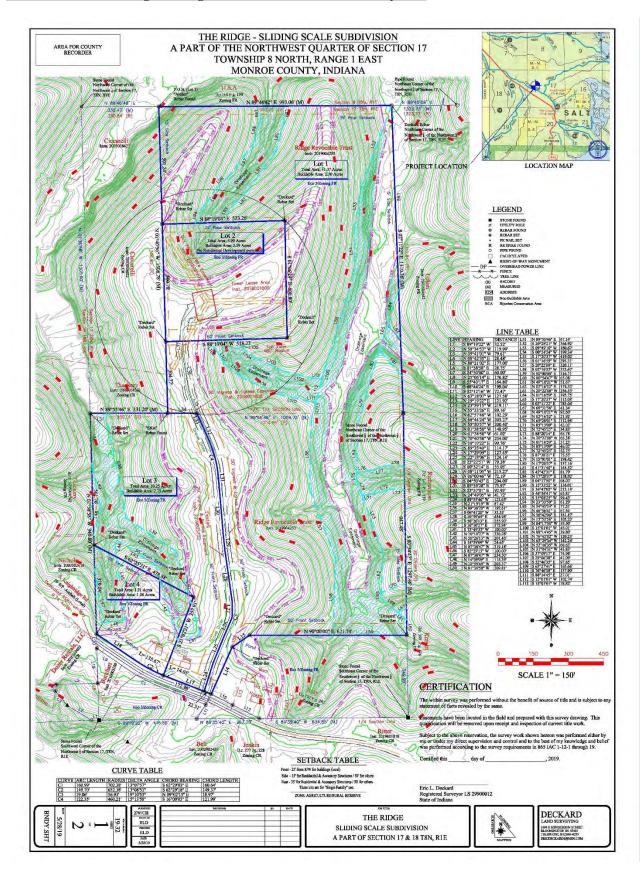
The Ridge Sliding Scale Subdivision Preliminary Plat
